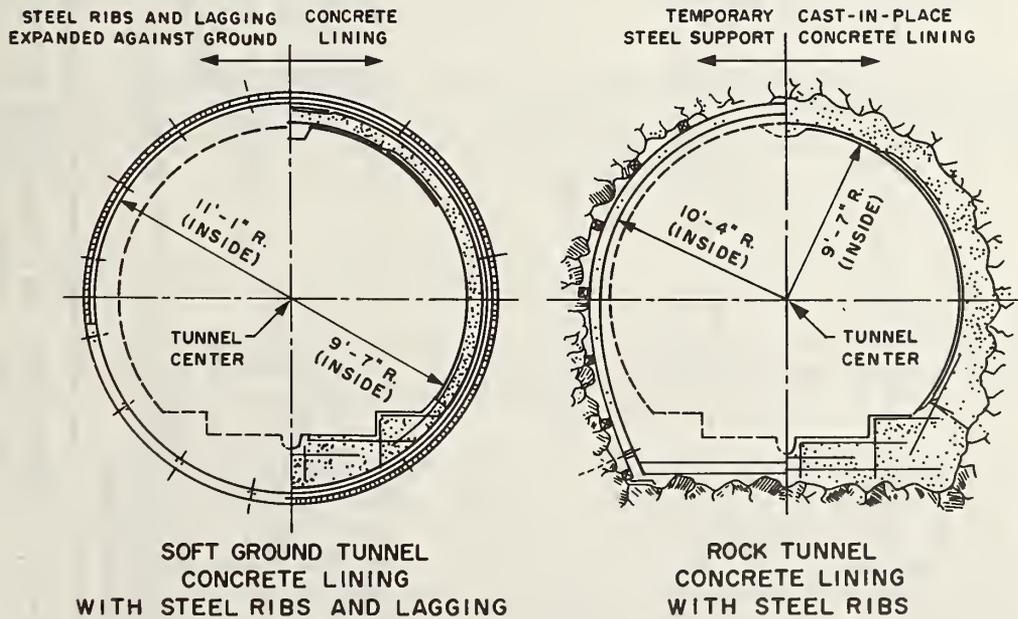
TYPICAL RED LINE TUNNEL SECTIONS
